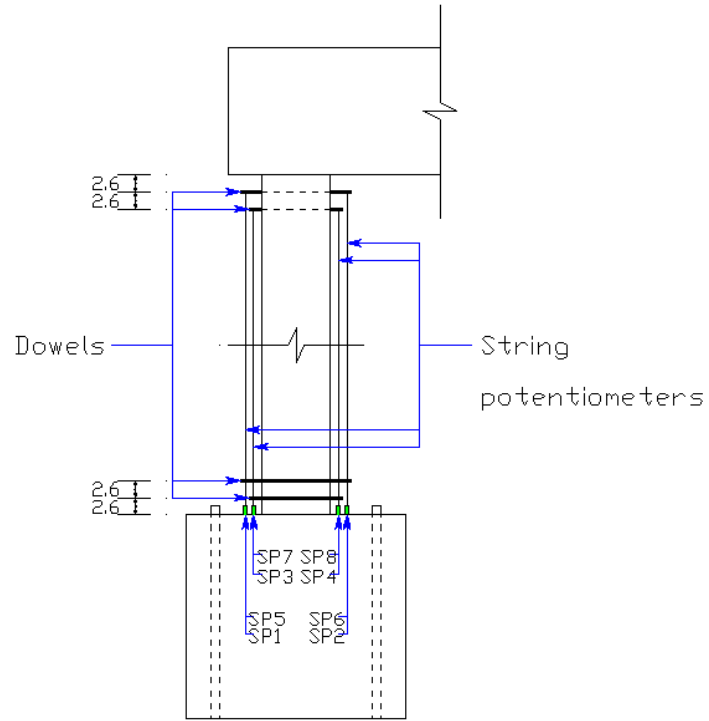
Layout of string potentiometers for specimen F-RC
